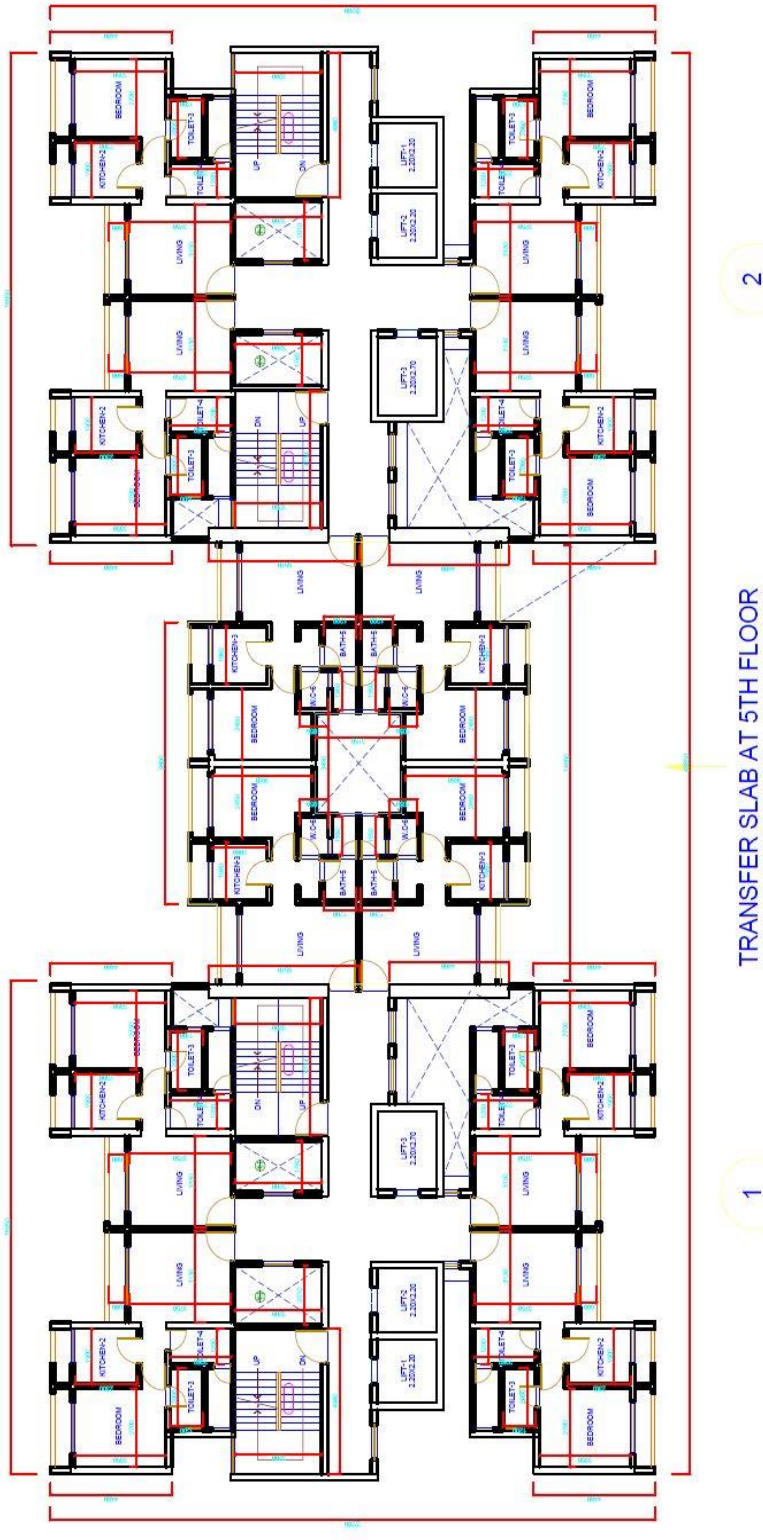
shows the plan of the building up to the 5<sup>th</sup> floor and above floors with and without transfer slab building
